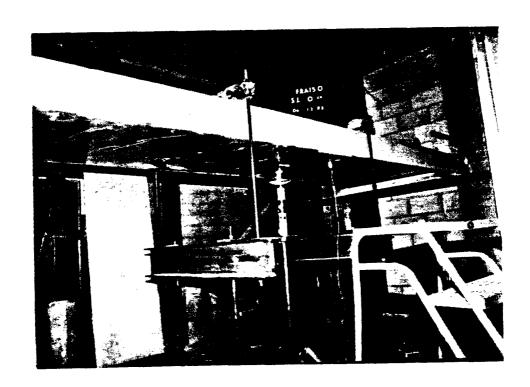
Temporary Adjustable Slab Support for Type I Specimens
